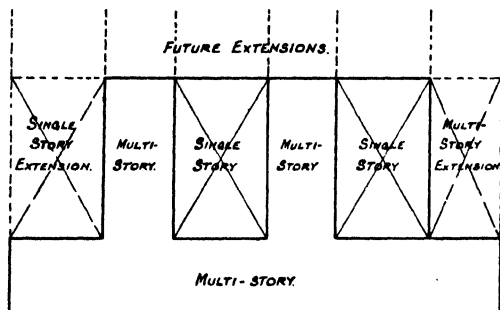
LAYOUT OF SINGLE- AND MULTI-STORY BUILDING
